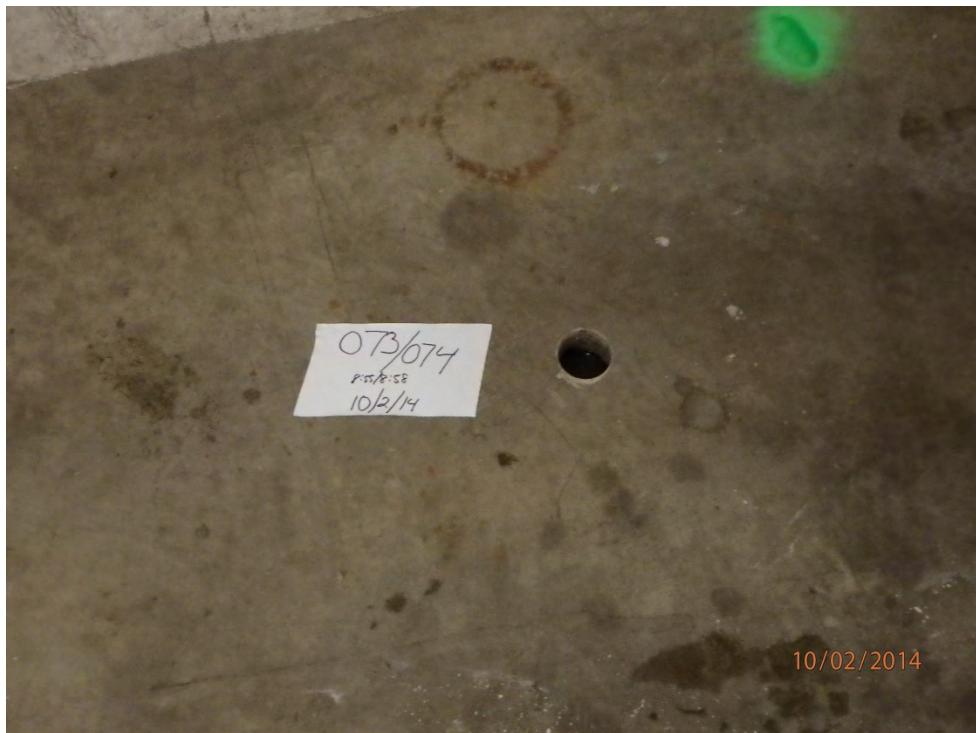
Samples 073 and 074 concrete core adjacent to shrink wrap near column N1
